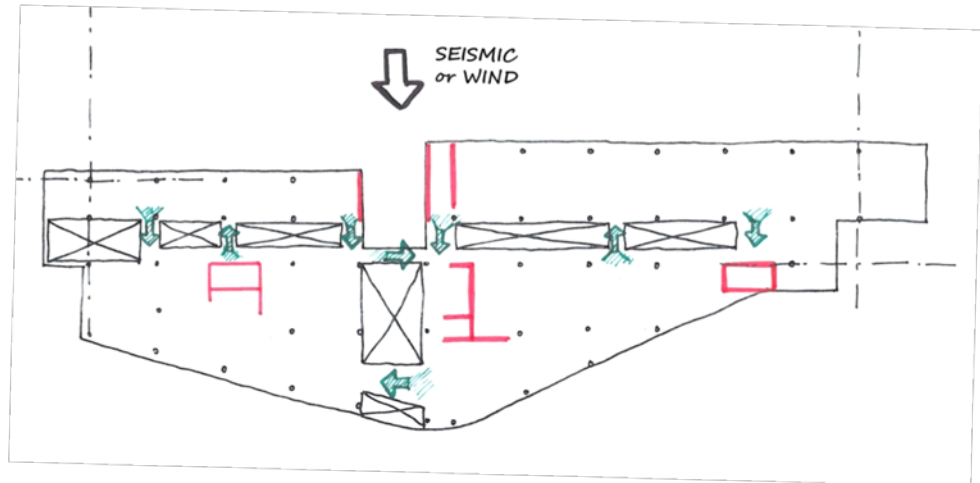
Lateral structural system frames (indicative) and force transfer around openings in slab diaphragm requiring defined load path.
